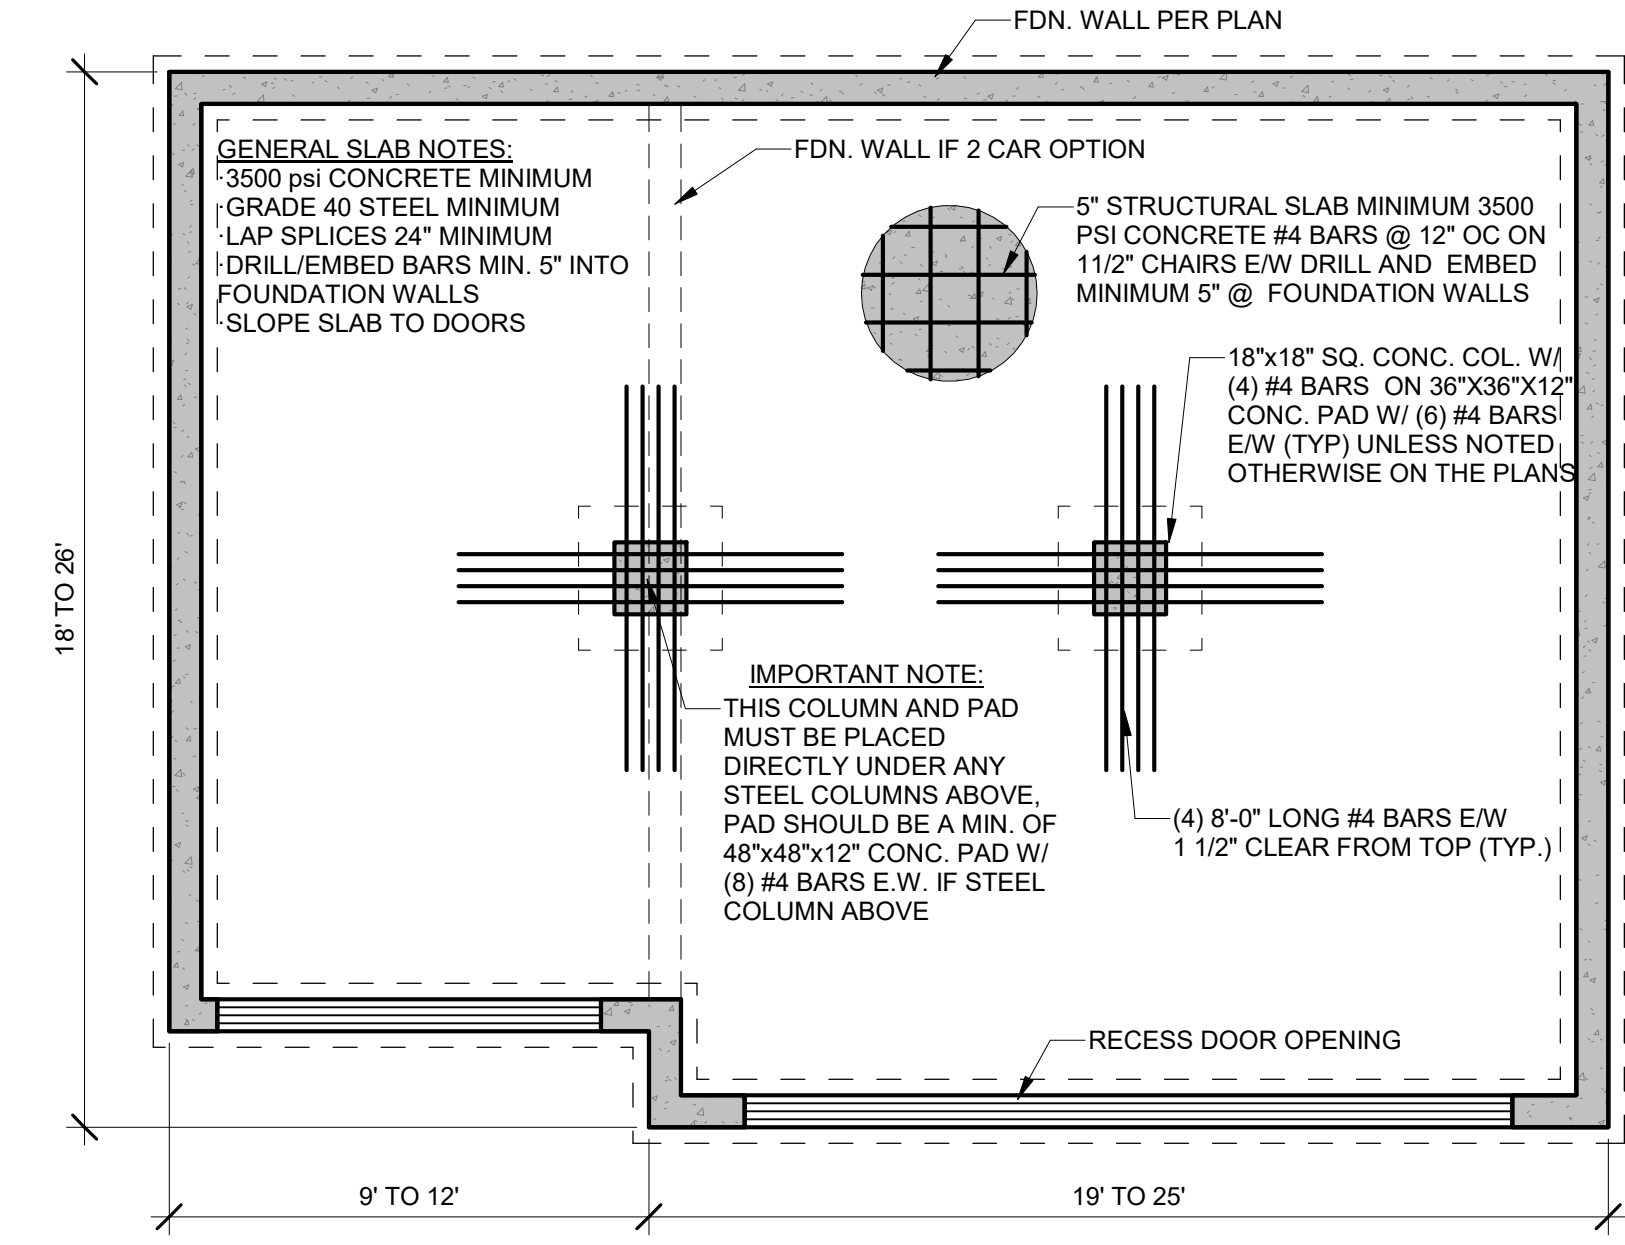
DETAILS PROVIDED ARE DERIVED FROM JOHNSON COUNTY RESIDENTIAL FOUNDATION GUIDELINE
